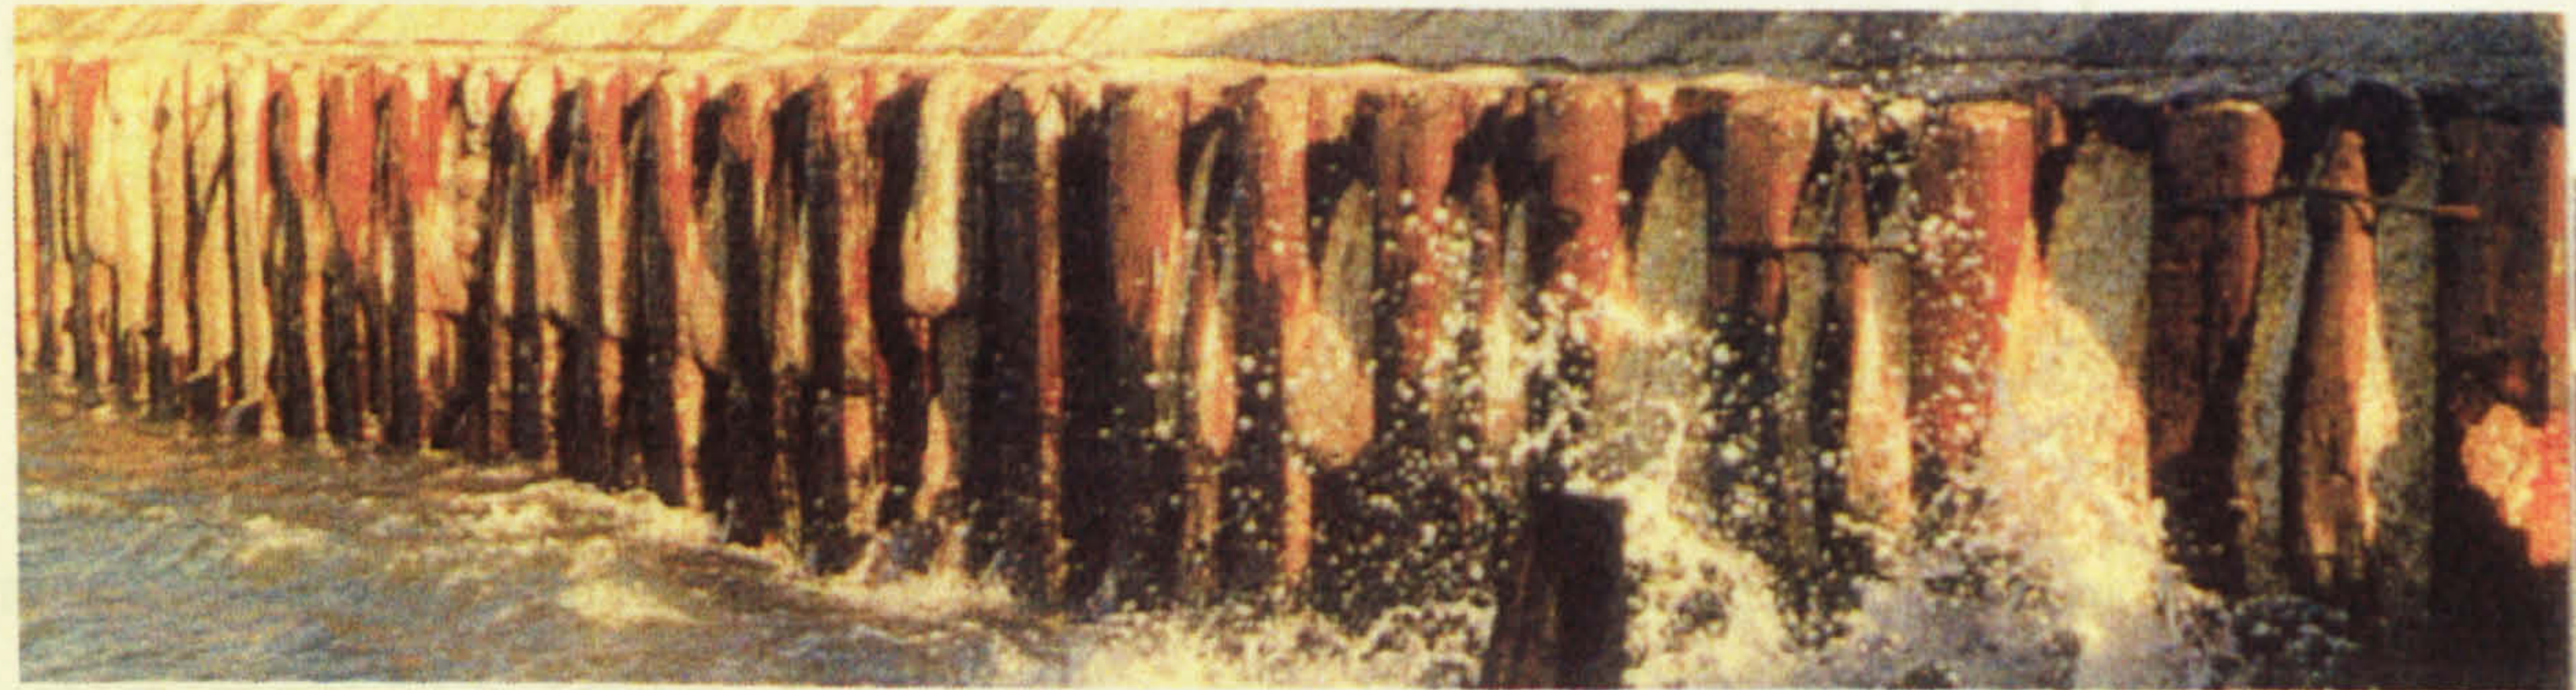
Sheet pile wall with a condition grade of “very poor”. Note that the piles appear to offer plenty of residual strength despite being in the worst possible condition grade category (Glennie et al., 1991)
